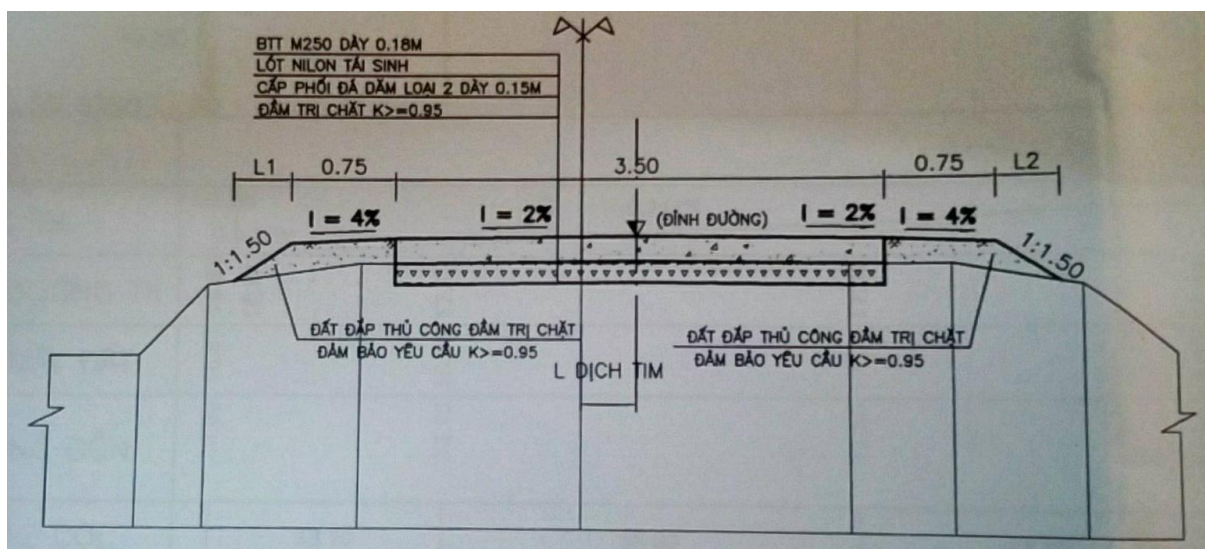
Cross section of road improvement in EM village in Ngoc Lac district
